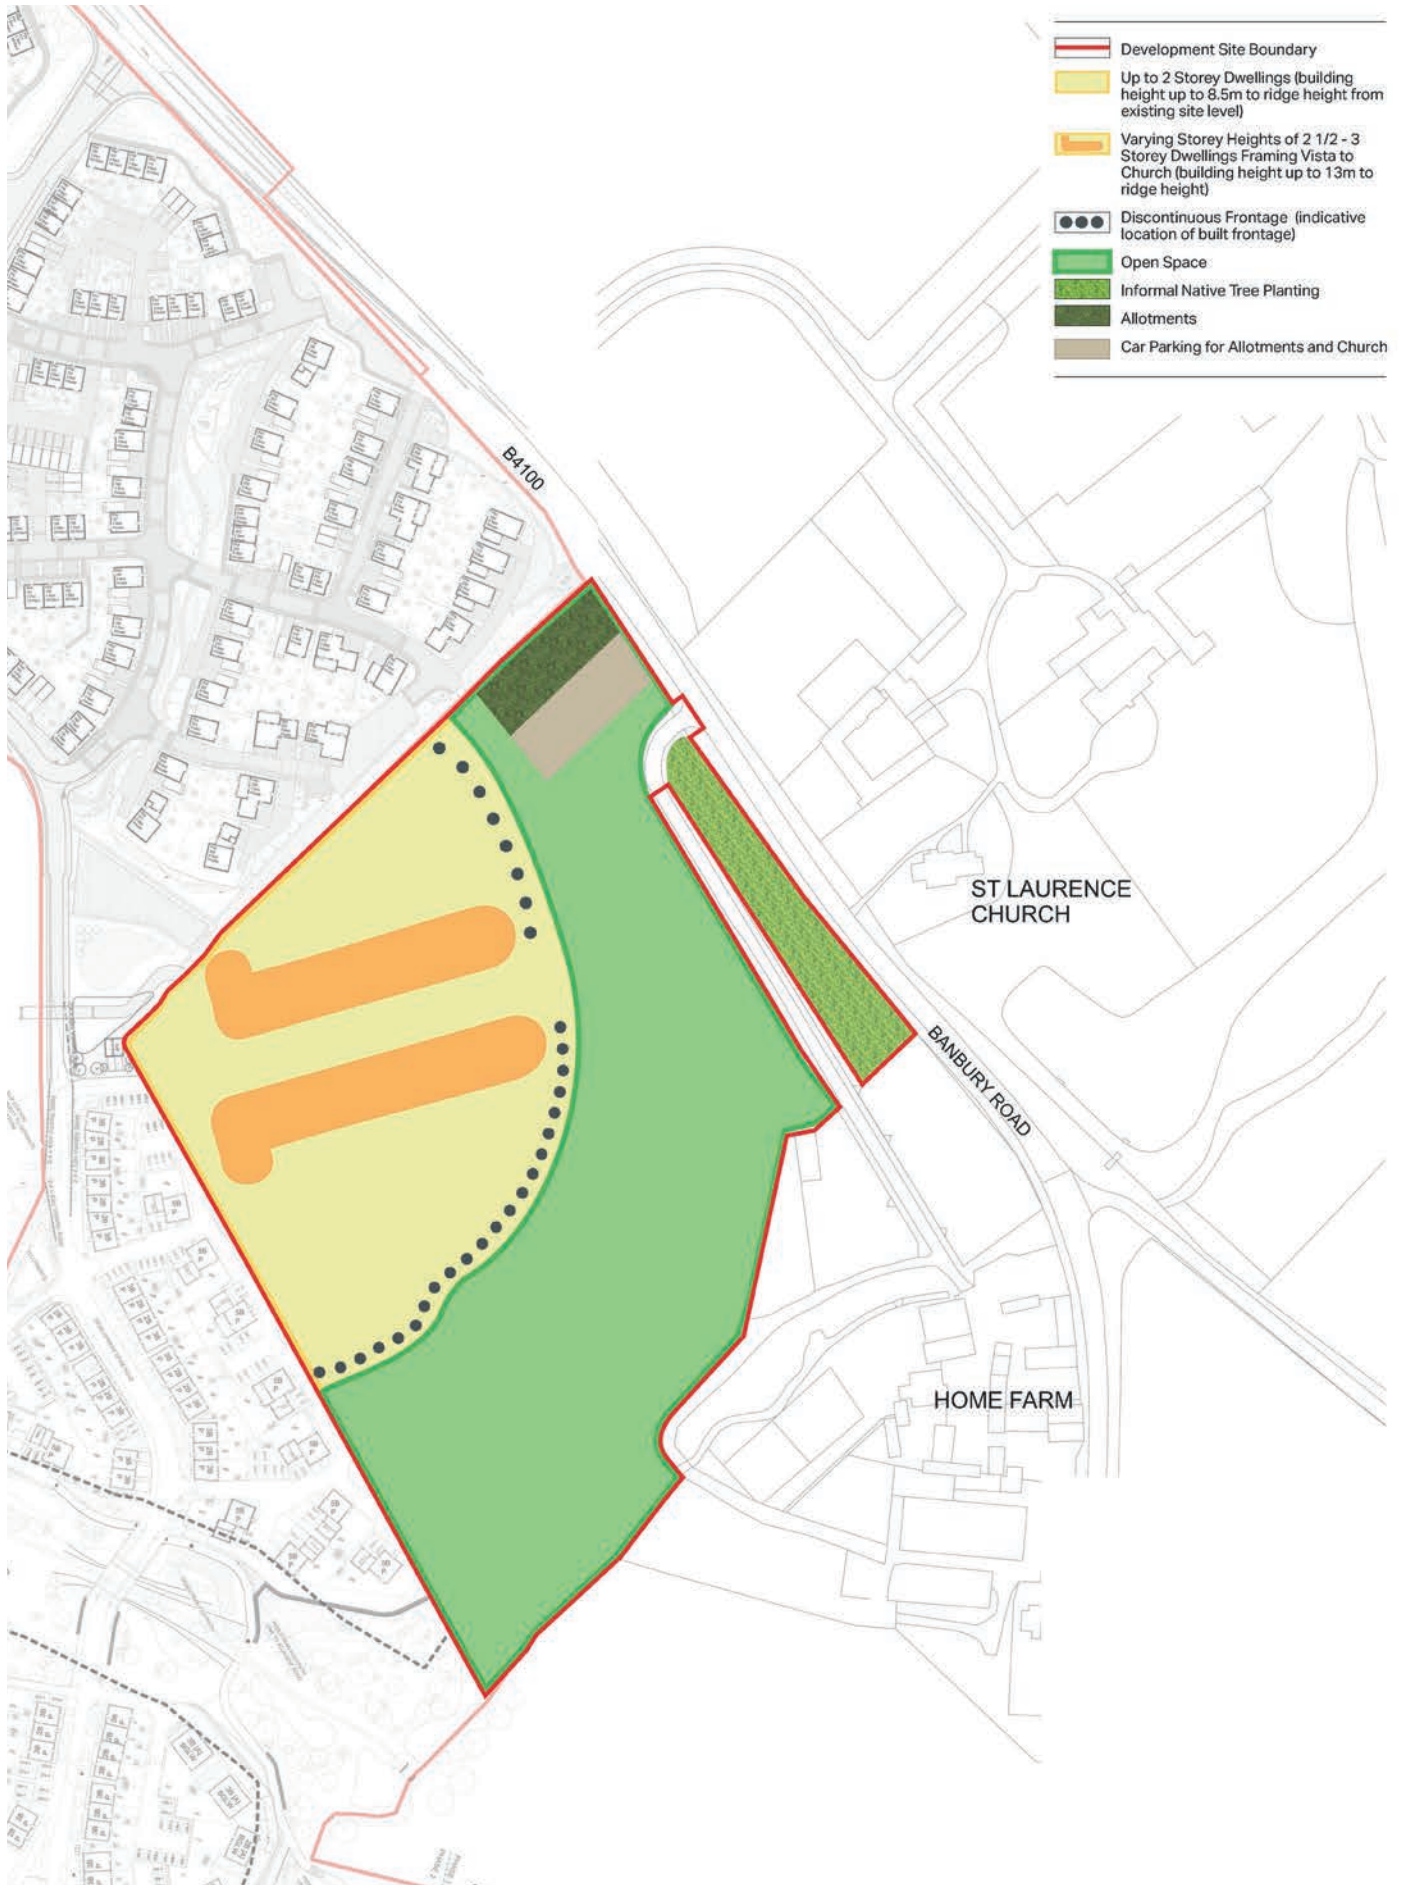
Built Form & Storey Heights Parameter Plan
